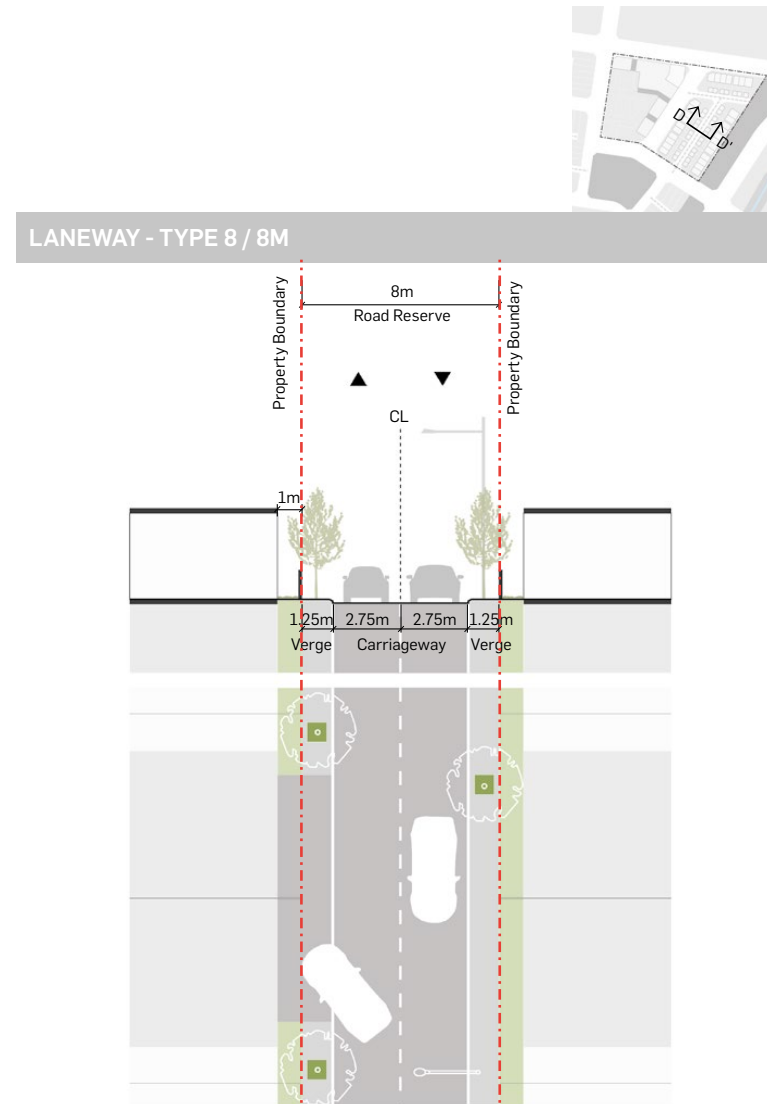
Indicative Street Section D-D' - Laneway - Type 8
